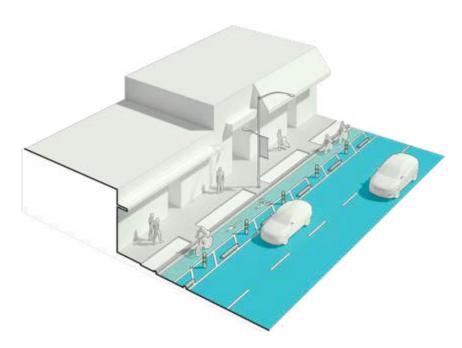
One-Way In-Street Class IV Bikeway, Adjacent to a Travel Lane, Protected by Wheel Stops and Bollards.
